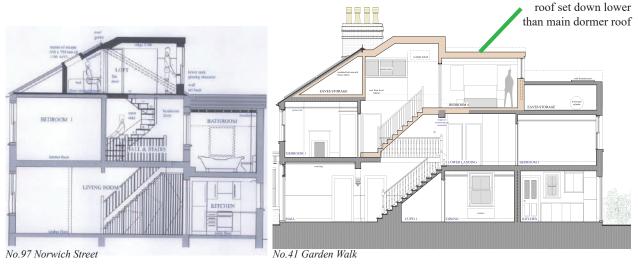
No.97 Norwich Street section showing higher dormer ridge set back from and beyond the existing roof ridgeline, alongside No.41 proposals using similar strategy of hiding higher level behind existing retained ridge.
